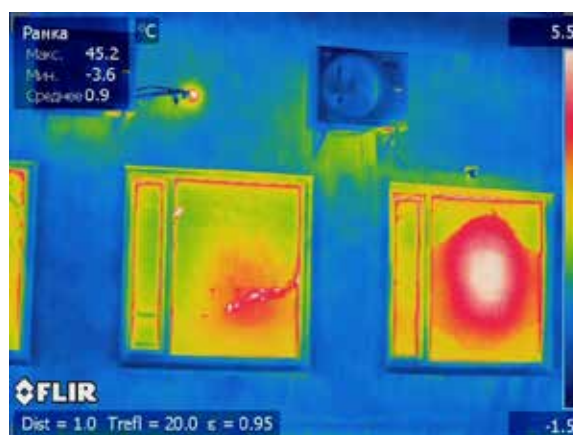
Heat leakage through the joints of walls and improperly installed windows units and air conditioners
